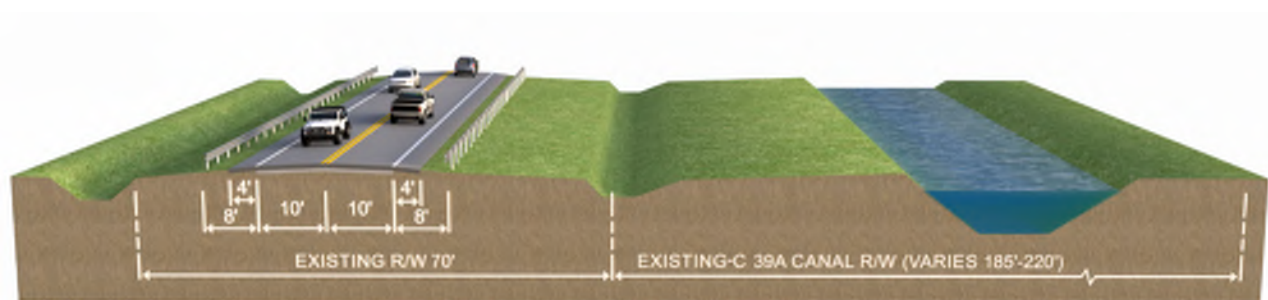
SR 70 – Existing Roadway Typical Section Two
